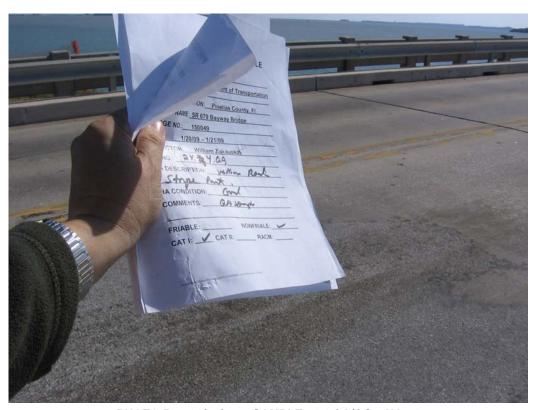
01/21/09 - SAMPLE 24.4 QA/QC - HA 24 YELLOW PAINT ROAD STRIPES
